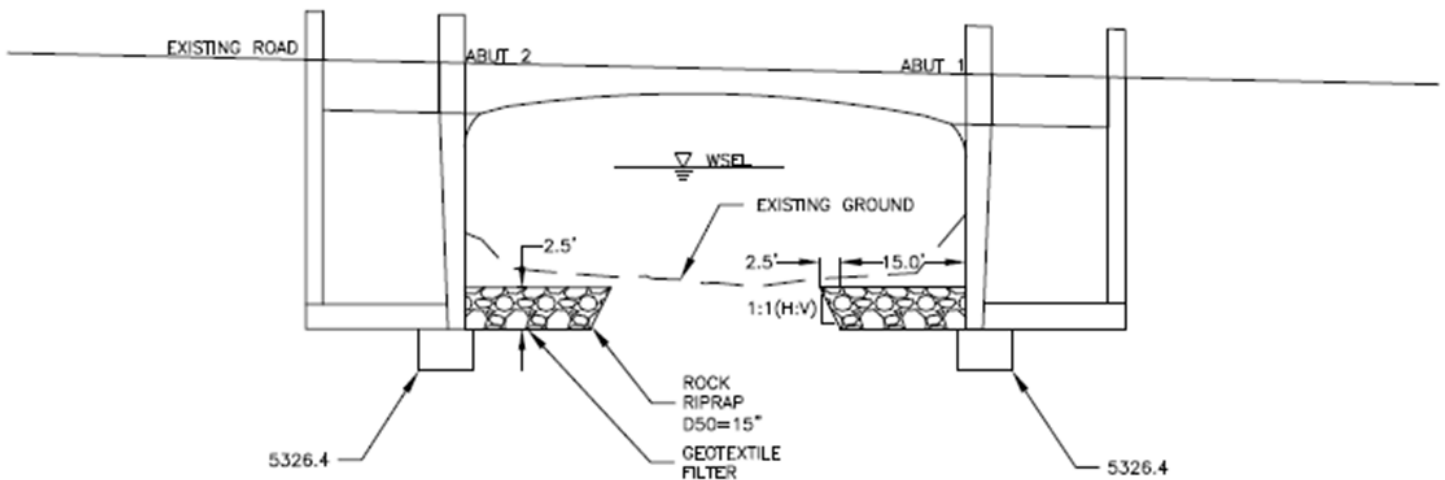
Cross-sectional view of Bridge D-15-A with recommended hydraulic scour countermeasures
